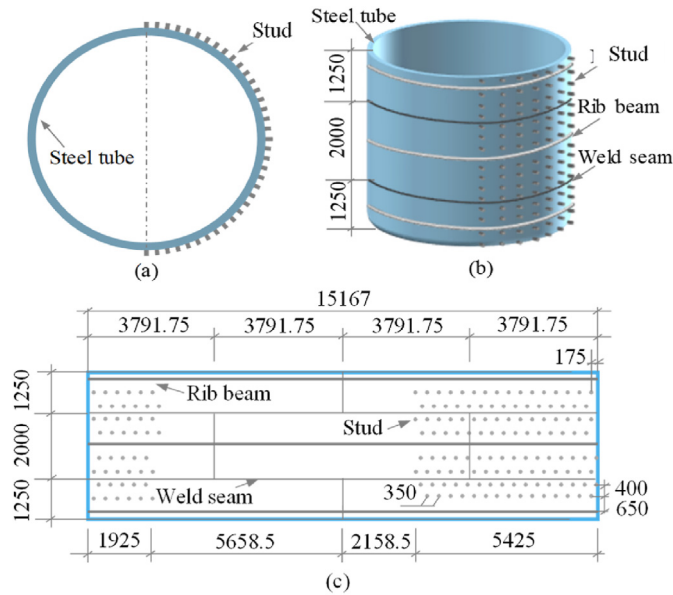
Stud arrangement on the steel tube: (a) Cross-sectional view of steel tube structure, (b) schematic of steel tube, and (c) detailed drawing of steel tube extrados wall (unit: mm).
